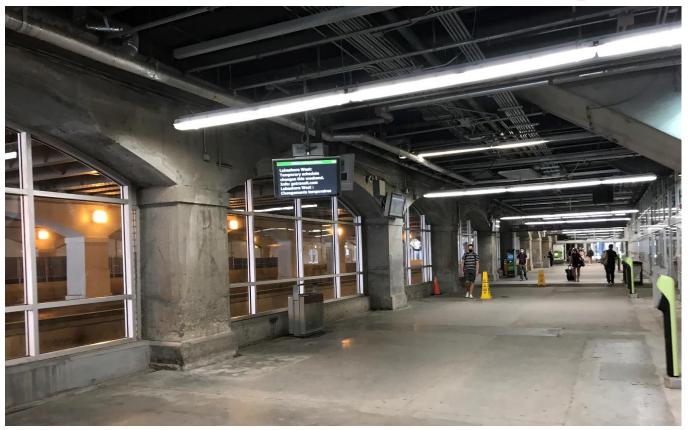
West Teamway showing board-formed concrete columns with segmentally arched openings on the left (adjacent to Bay Street)
